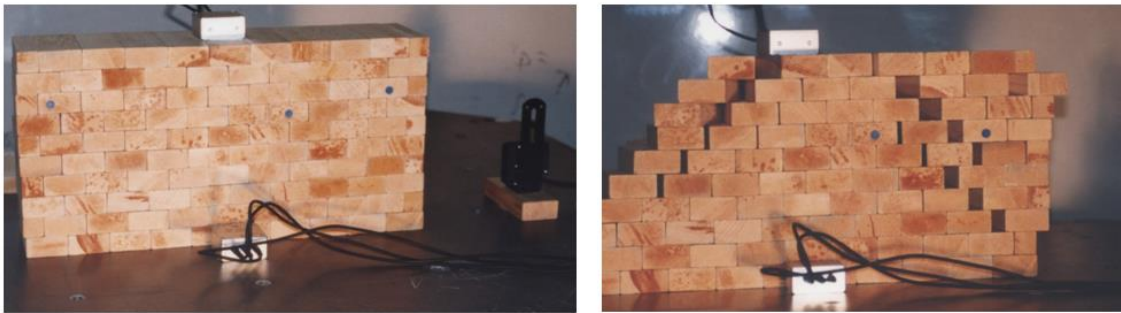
Views of the wall with 9 layers of wooden blocks before and after shaking
